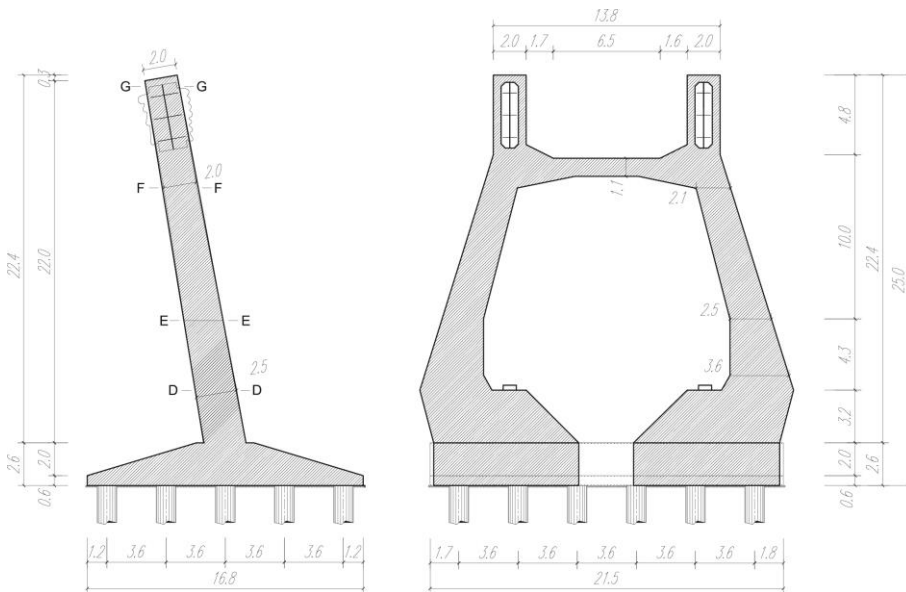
Lateral plane and elevation plane of tower (unit: m)
